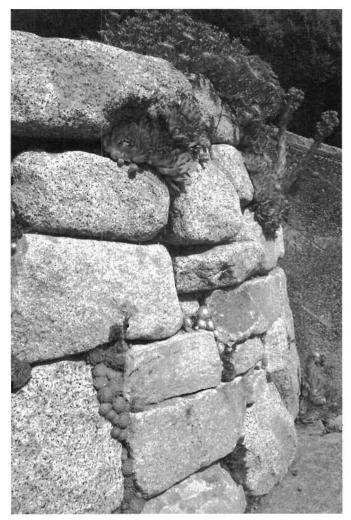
Vegetation between retaining-wall rocks. Stonework by Goettling McGee, Inc., Seattle, Washington.
